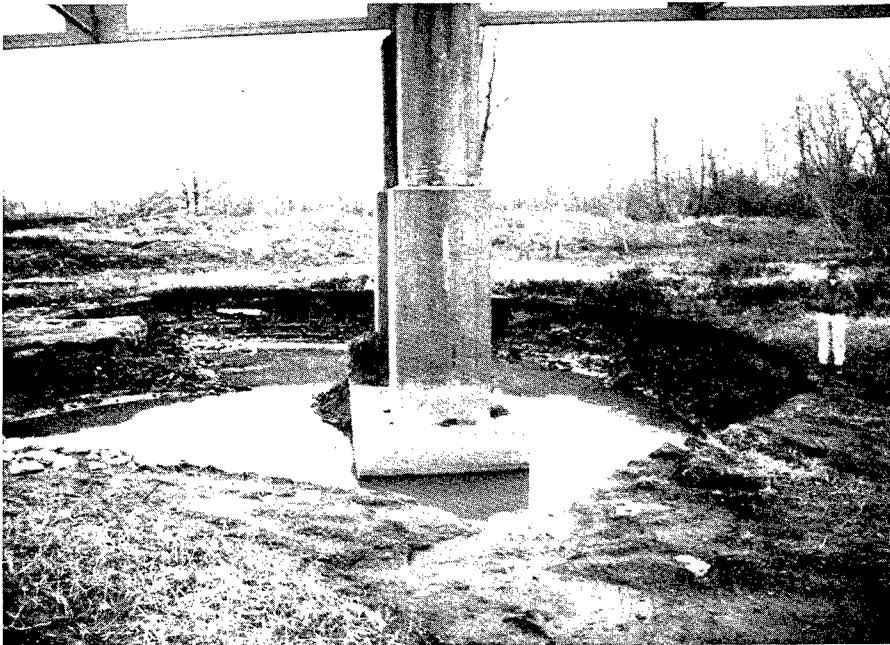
U.S. Highway 159 bridge pier located downstream of pier shown in Figure 3.45.
